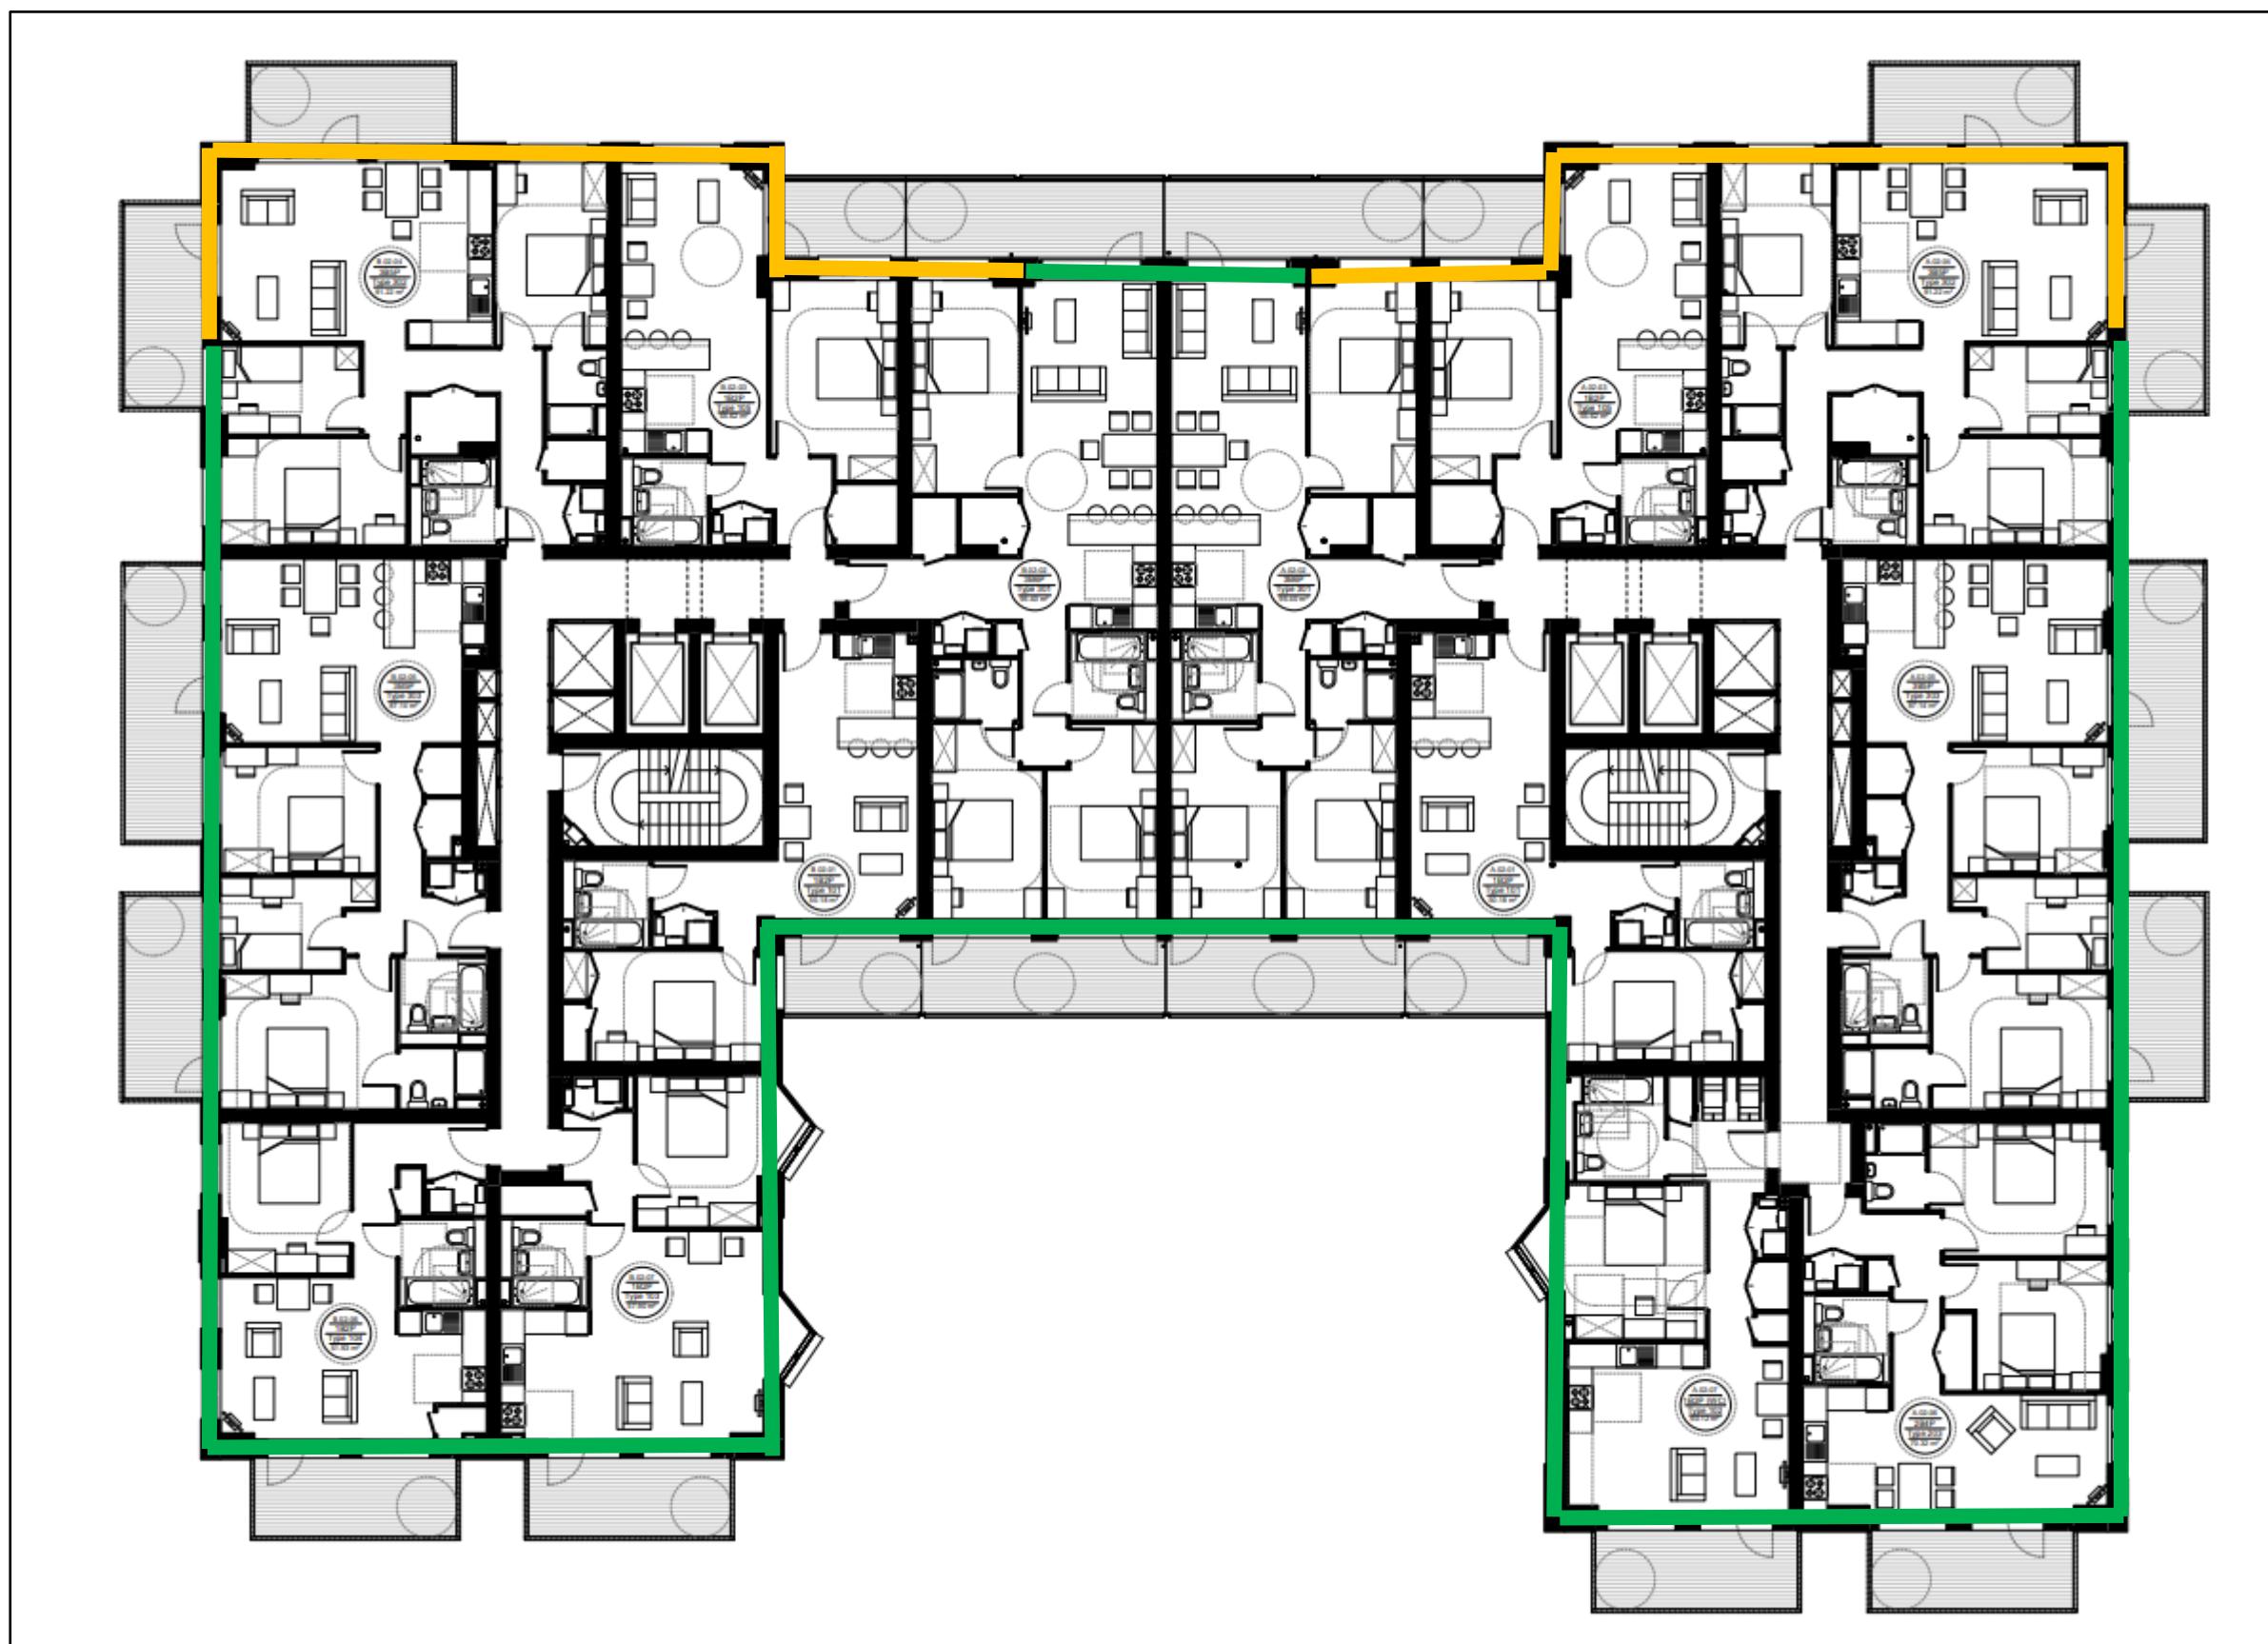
Acoustic glazing "Façade Zones" – Level 02 to Level 04
